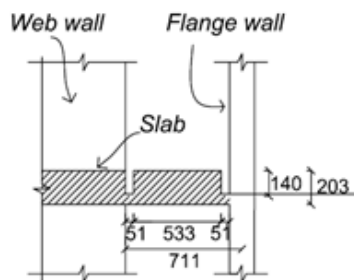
Slotted Connection. Panagiotou, M., and Restrepo, J. (2010), “Displacement-Based Method of Analysis for Regular Reinforced-Concrete Wall Buildings: Application to a Full-Scale 7-Story Building Slice Tested at UC–San Diego.” *Journal of Structural Engineering* 137 (6): 677–90. Used under fair use, 2014.
